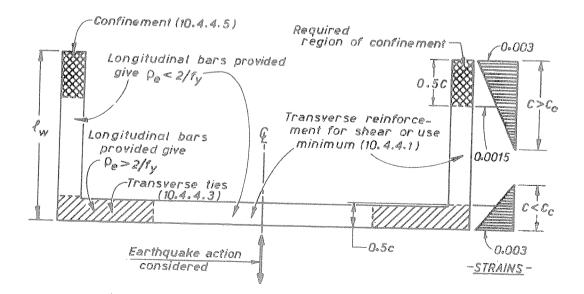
Regions of Different Transverse Reinforcement in a Shear Wall Section.
